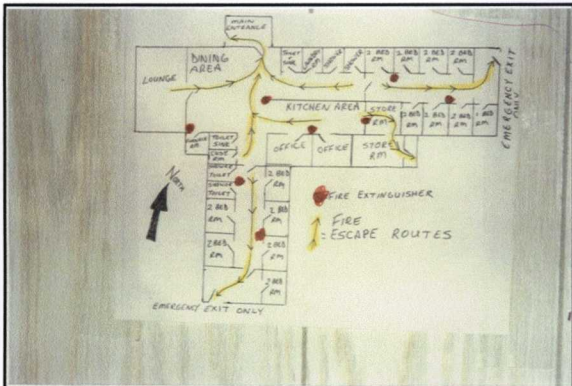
Floor plan for Sivugag Lodge (used for contractor meals and lodging).
